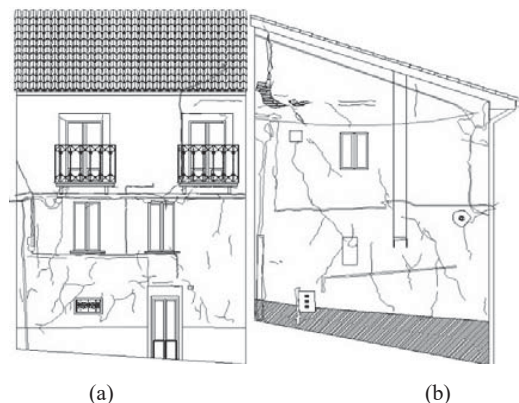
Crack pattern after the earthquake: (a) damages on the lower part of the building, (b) façade rocking mechanism
